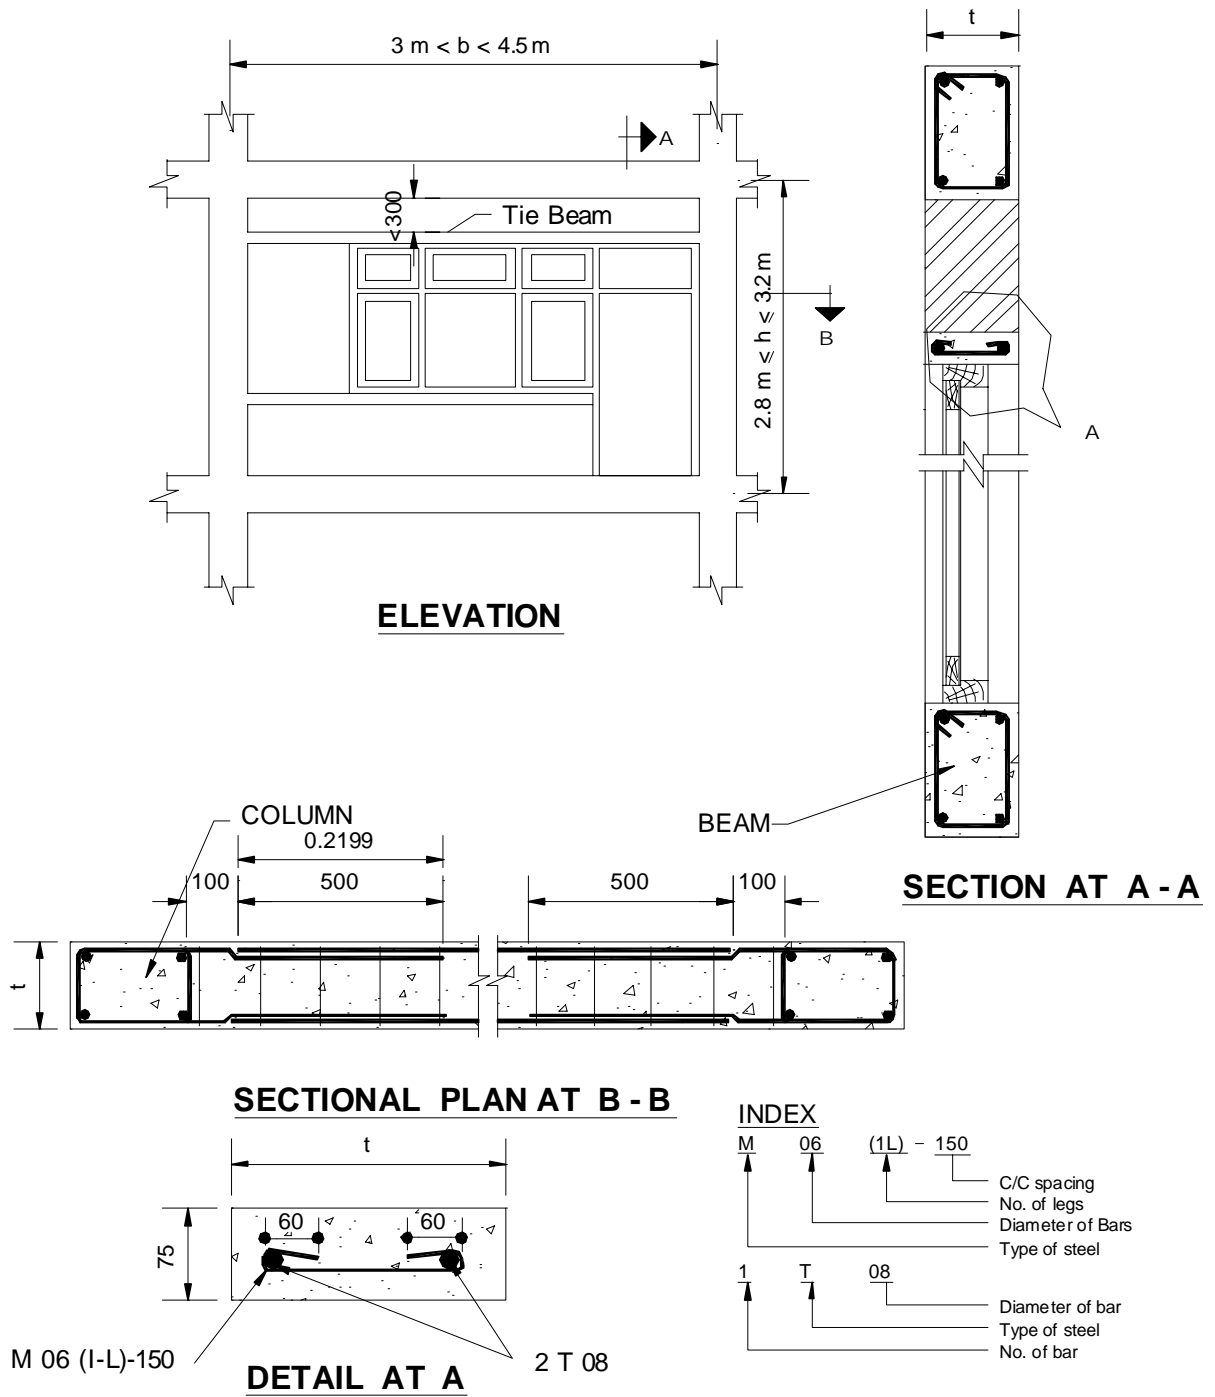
Tie-Band Details for a Non-Structural Wall
